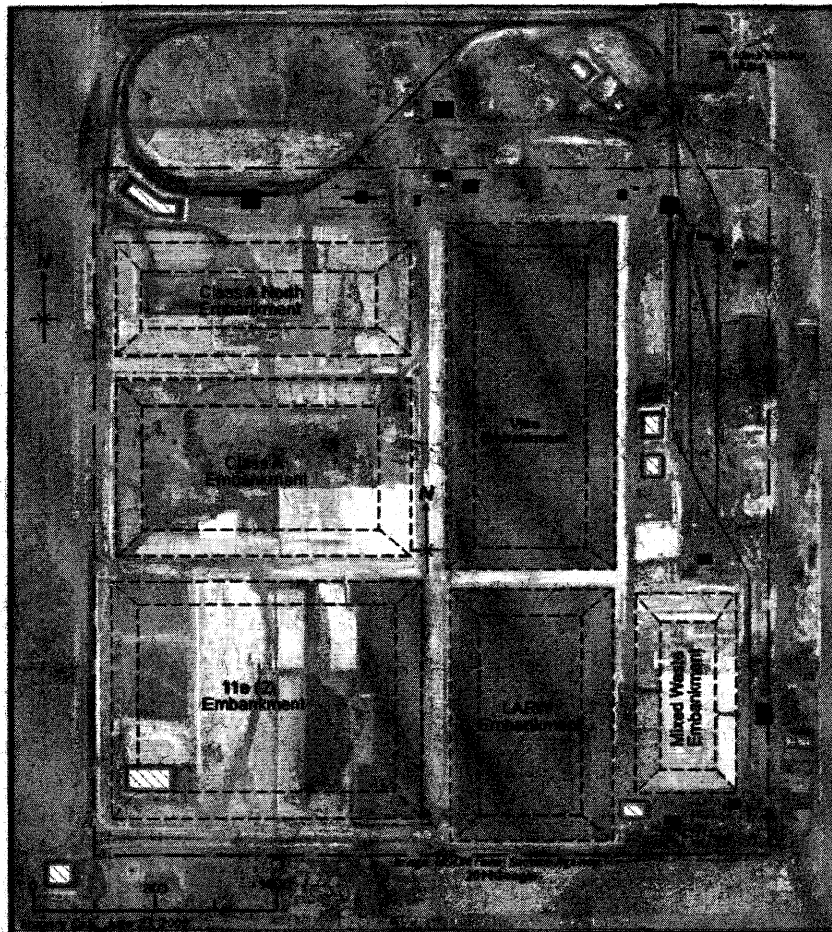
Layout of the Clive facility embankments, with the MW embankment in the southeastern part of the facility.
